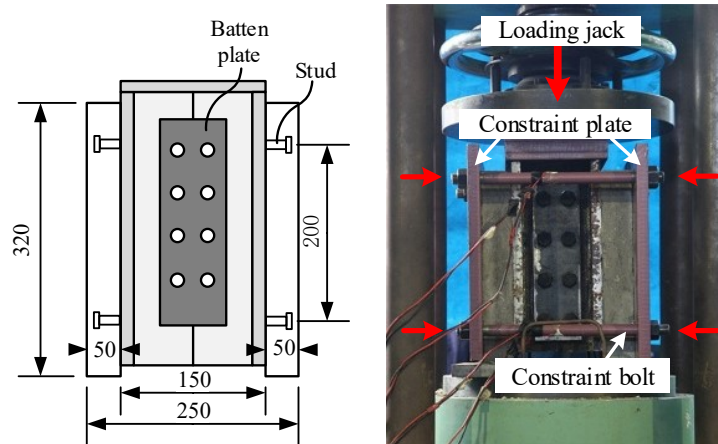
Push-out specimen and the test method. (a) push-out specimen (b) testing pattern
